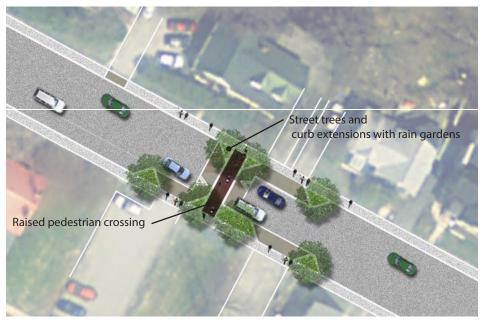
Plan for a typical enhanced mid-block crossing with curb extensions and rain gardens.
